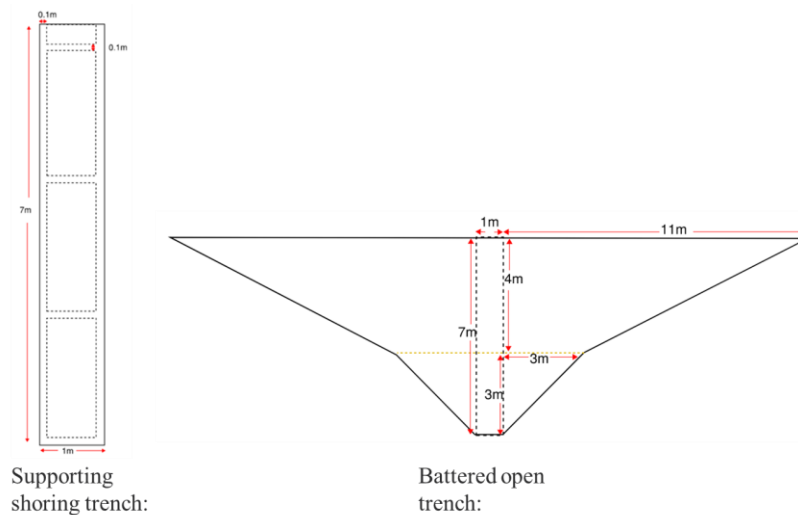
Trench cross-section showing possible excavation options for EC evaluation
